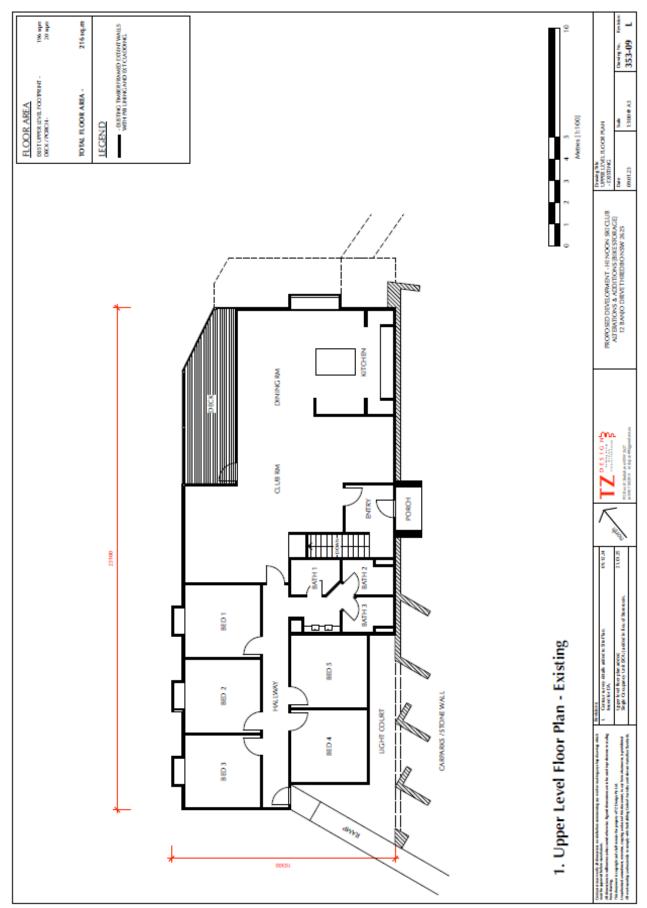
Upper Level Floor Plan - Existing (Source: TZ Designs, January 2025)
